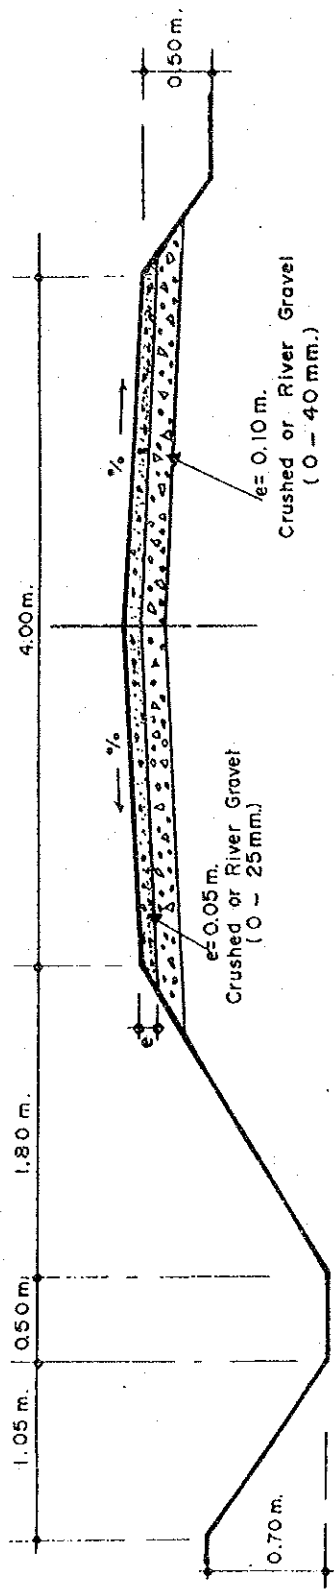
TYPICAL SECTION OF PENETRATION ROAD
